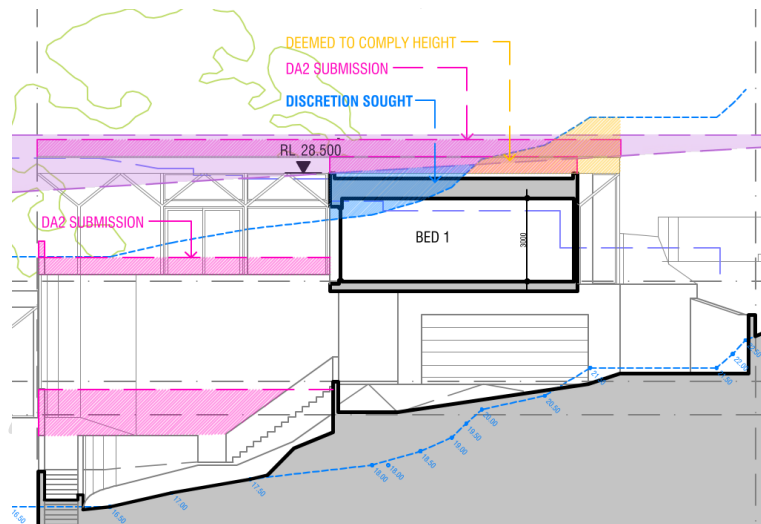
Unit 2 Northern Elevation with Blue Area Showing Bed 1 Roof Over 9m.
